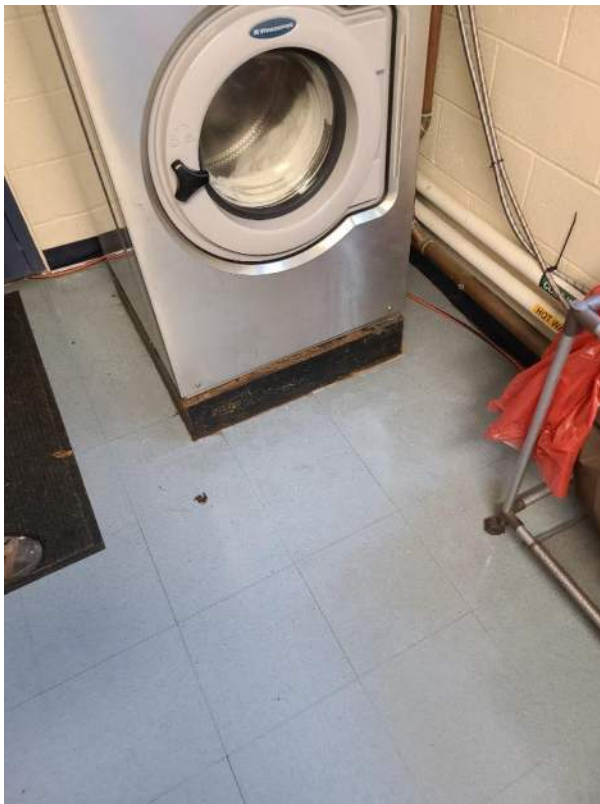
Delamination on Fire Station Side floor in laundry / boiler room.
